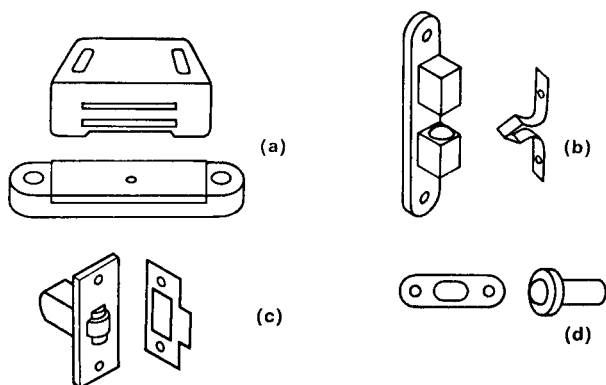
Types of catches. (a) Magnetic. (b) Spring. (c) Roller. (d) Ball catch.
